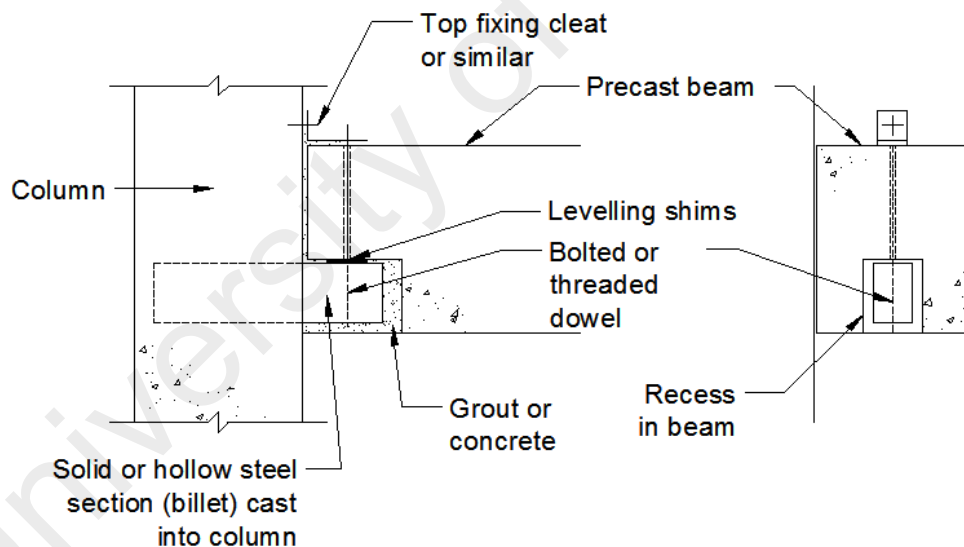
Precast beam to column connection using solid or hollow billet section with threaded dowel and top angle fixing (Elliott, 1996).
